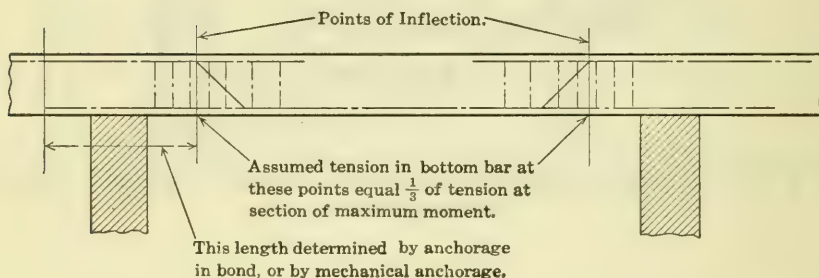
TYPICAL WEB REINFORCEMENT FOR CONTINUOUS BEAMS.
